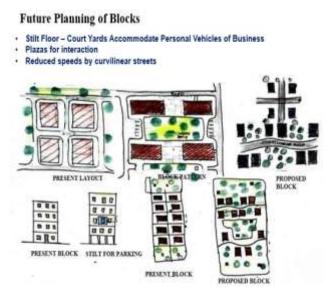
Proposed Street pattern placement of Blocks Source: Author
